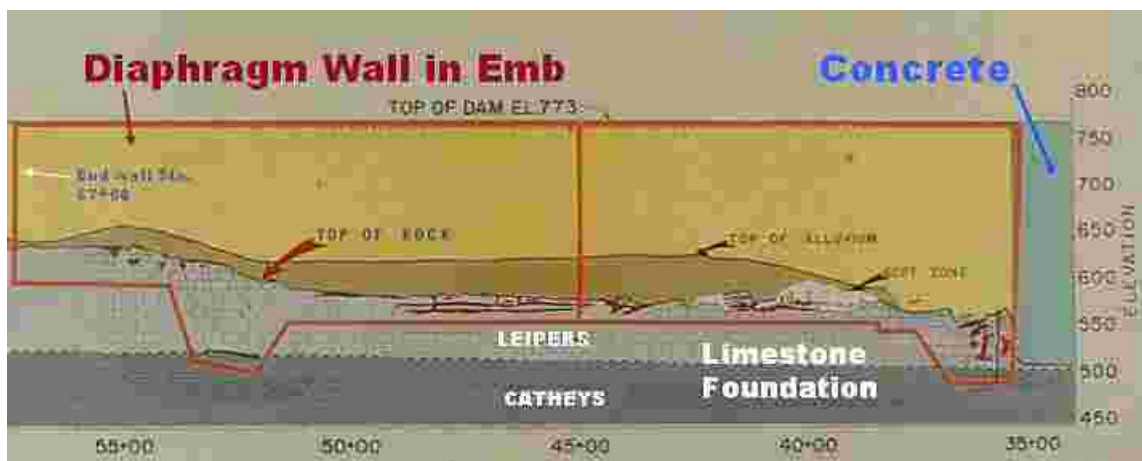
Profile of Cutoff Wall Looking Upstream Showing Depth and Lateral Extent
